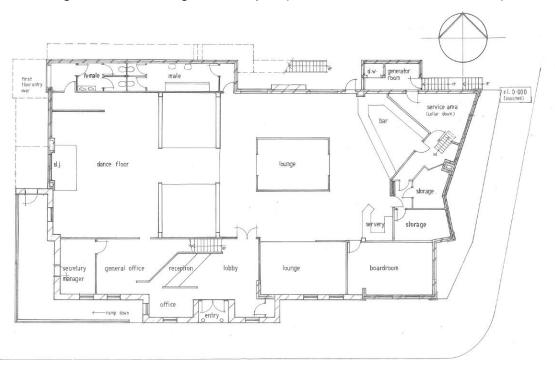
2011 Lower ground floor plan (Unknown Author provided by Northern Beaches Council)
